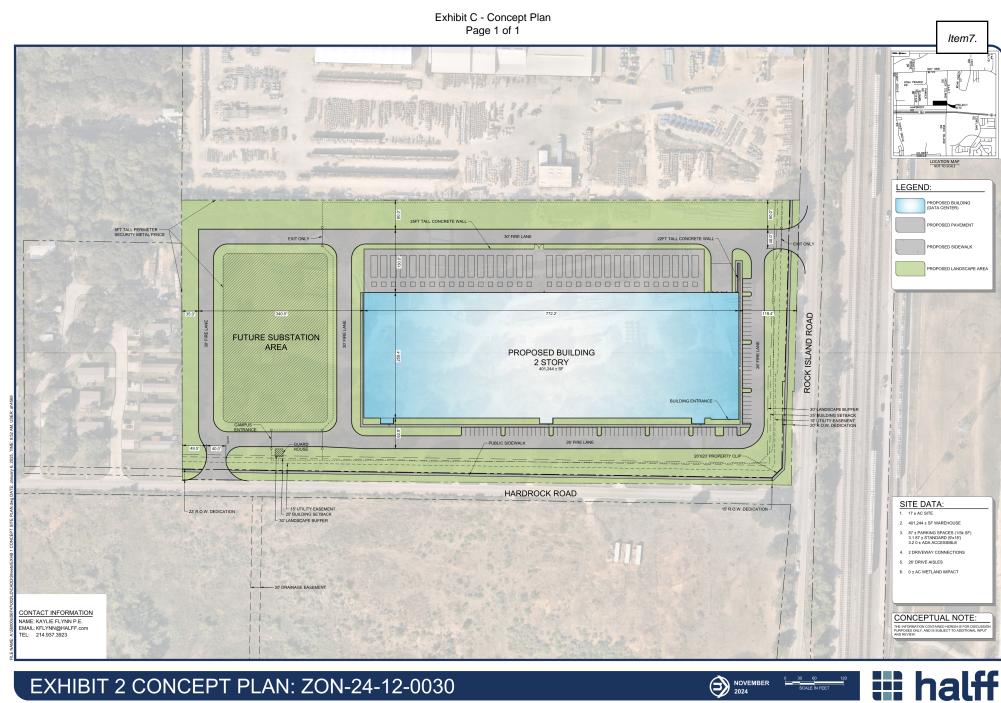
CONCEPT PLAN: ZON-24-12-0030
